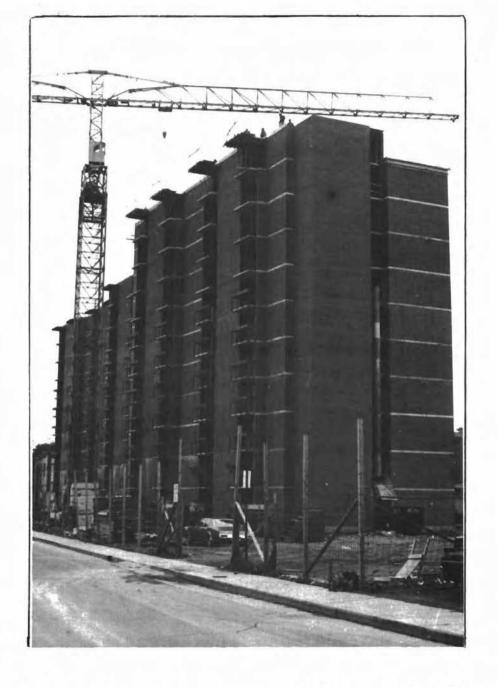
10-storey building of load-bearing "T. T. W." brick walls, under construction in June, 1970.
